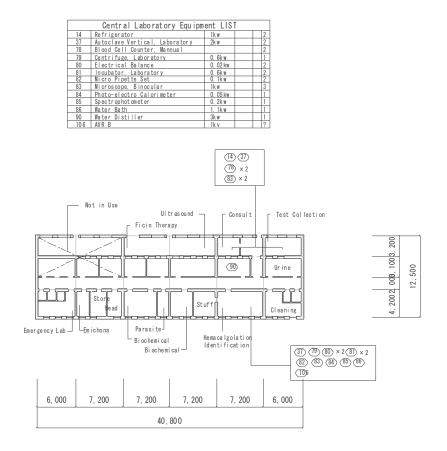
No. 8 1 F • 2 F PLAN S=1:500
